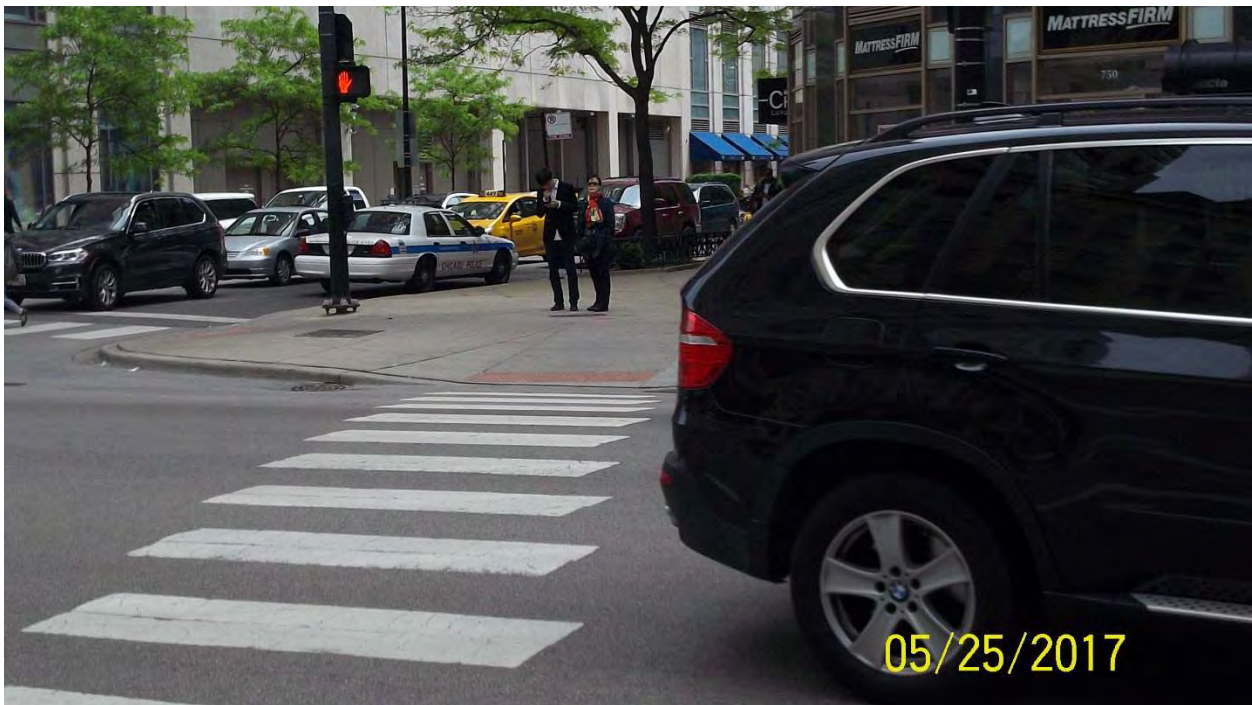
Northwest corner of Chicago Ave. / Rush St. – Looking South
